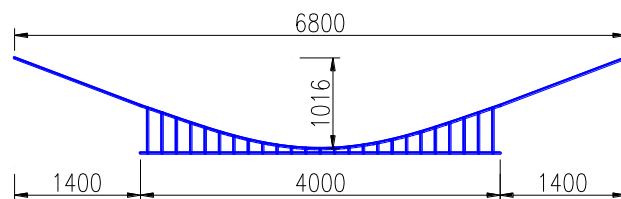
Elevation of full bridge aeroelastic model (unit: mm)
